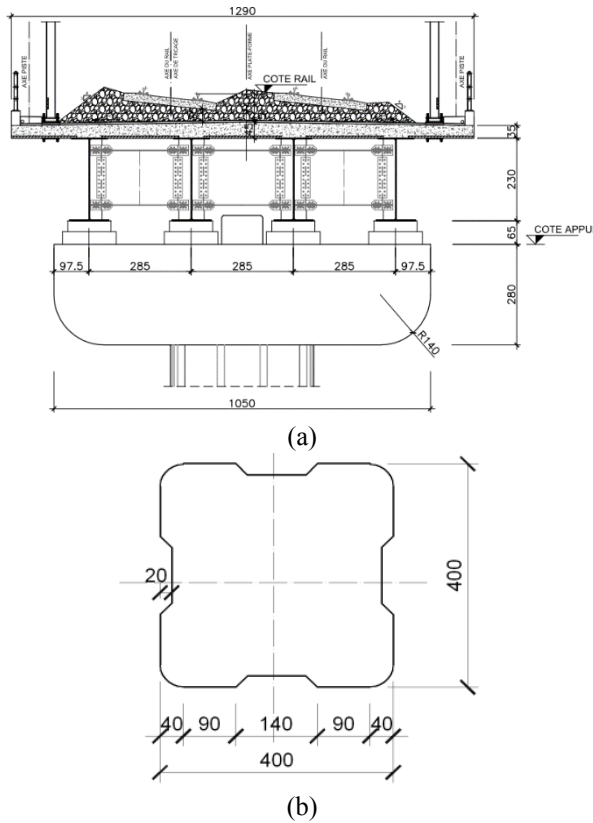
Structural elements sections (in cm) (a) section of the deck; (b) Piers section
